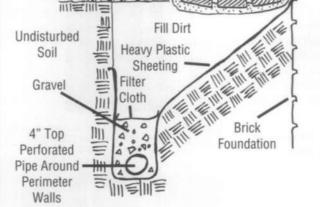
This detail drawing shows a sub-surface perimeter drain in conjunction with a historic brick ground gutter system to help control roof run-off moisture from entering the historic foundation. Detail. Courtesy, Gunston Hall Plantation. Photo: Elizabeth Sasser.
